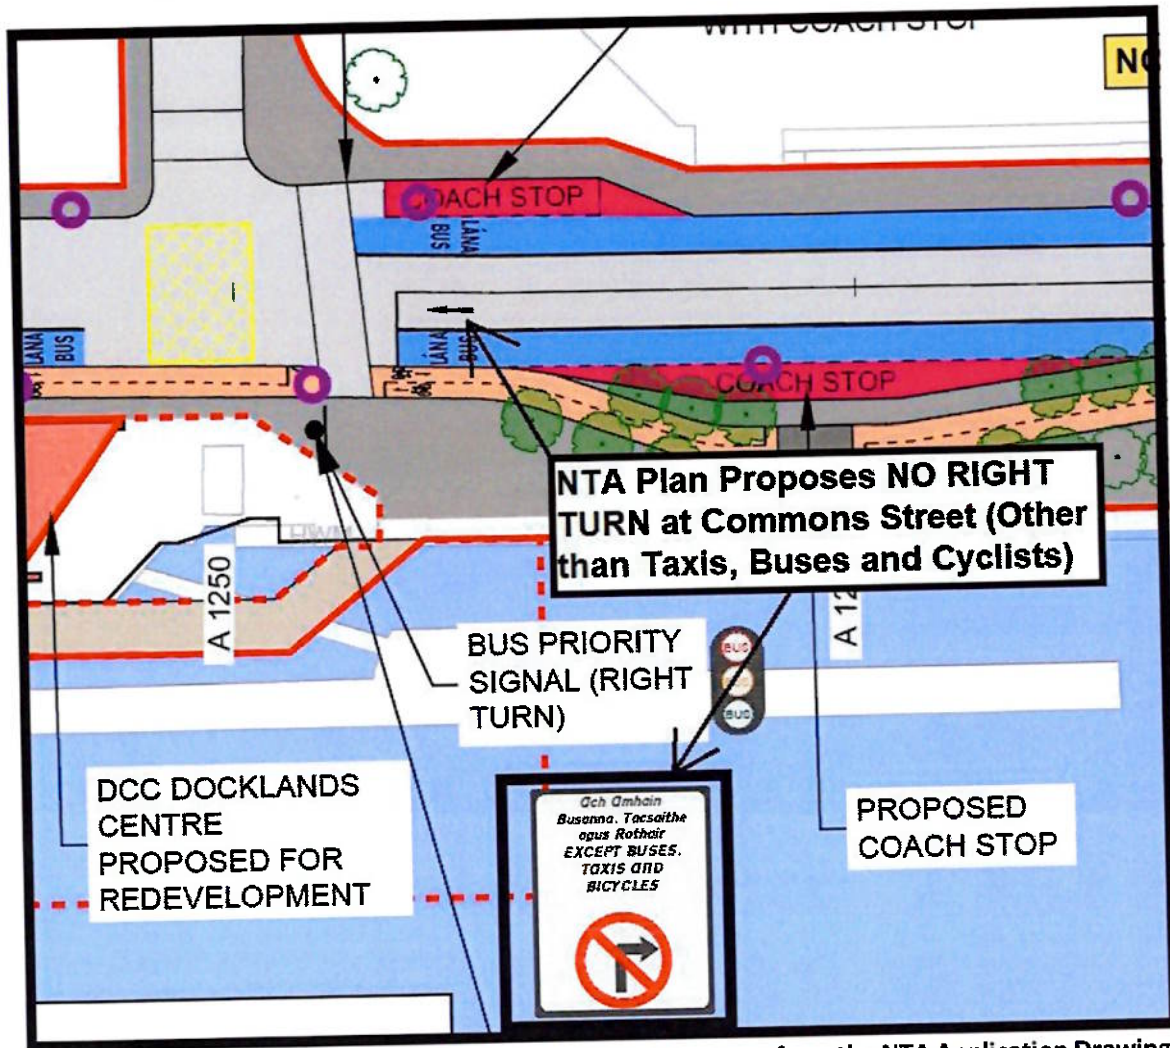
NRB Consulting Engineers' annotated extract from the NTA Application Drawings prepared. (Source: General Arrangement Sheet 02 of 12.)
